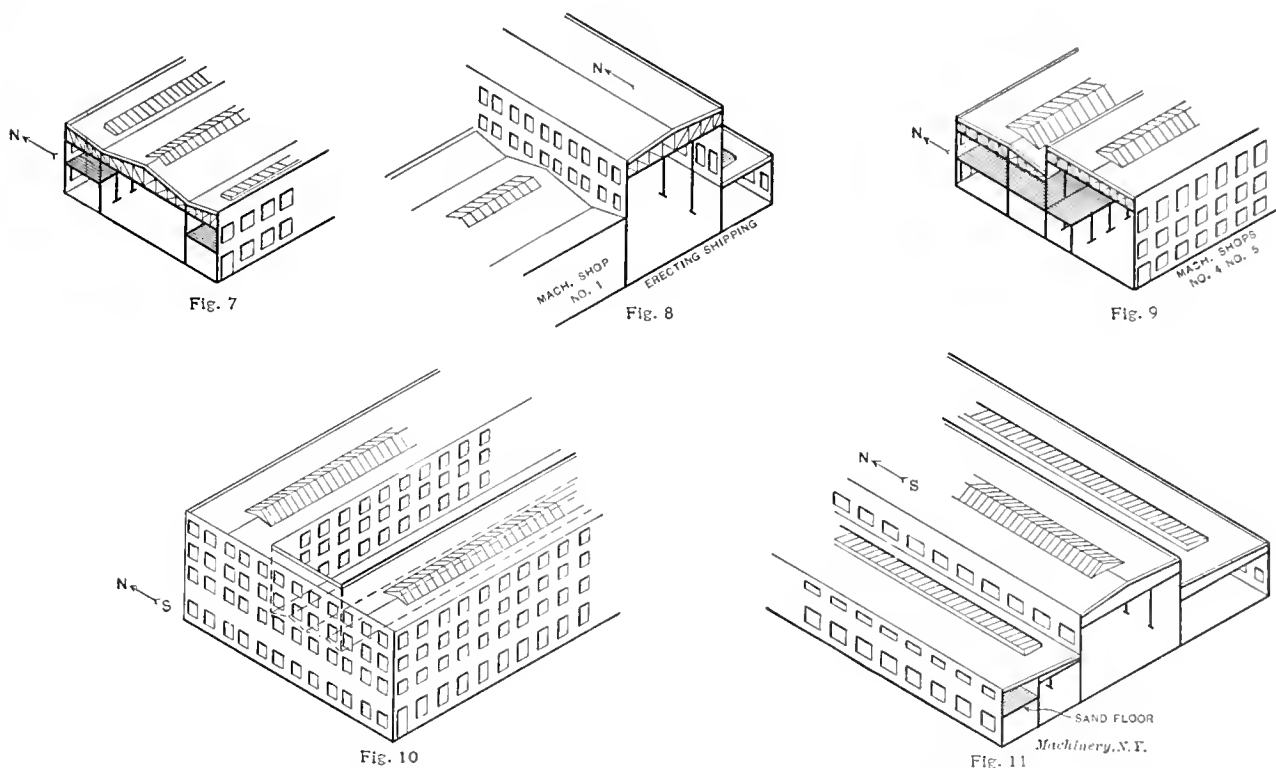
Machine Shops Nos. 1 and 2 of the Plant shown in Fig. 4. Fig. 8. Erecting and Shipping Department. Fig. 9. Machine Shops Nos. 4 and 5. Fig. 10. Machine Shop No. 6. Fig. 11. Foundry.
